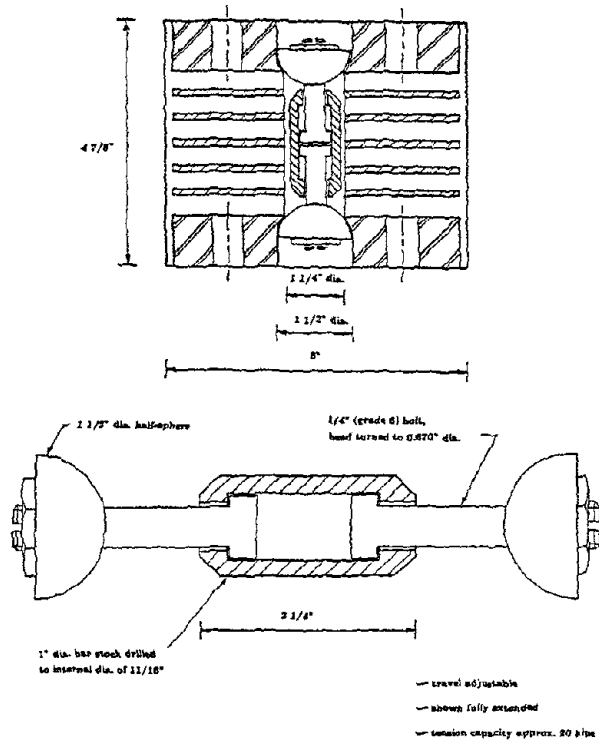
BEARING MODIFIED TO ACCEPT DISPLACEMENT CONTROL DEVICE
